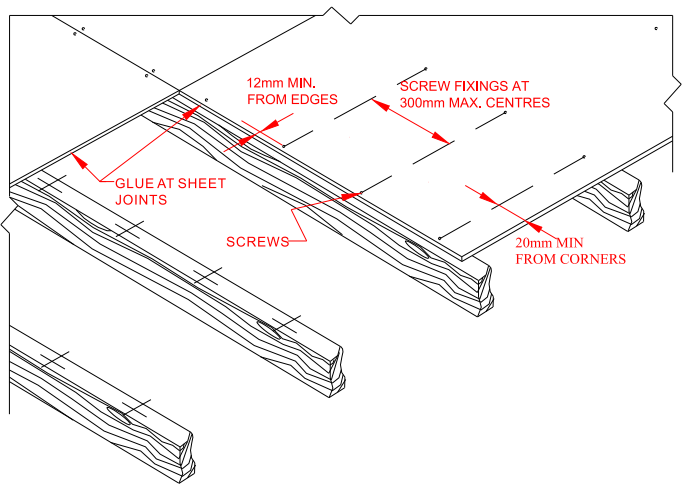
FIG. B - FIXING FOR RESIDENTIAL APPLICATIONS AND TOILET OR SHOWER AREAS
